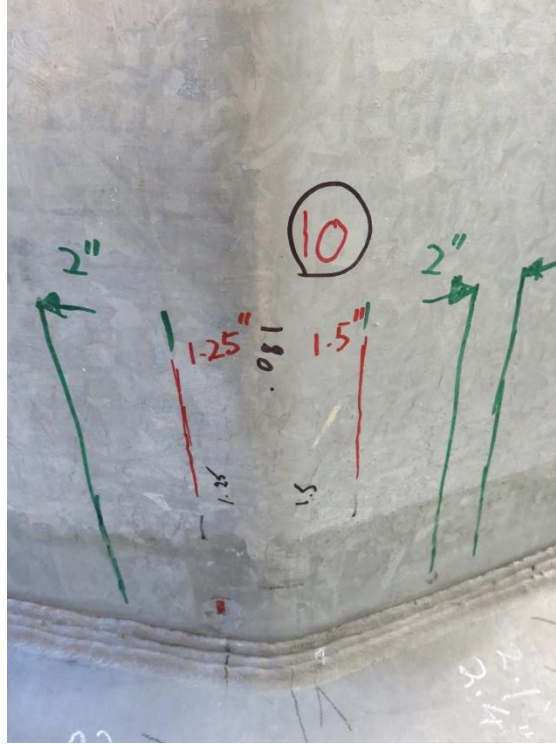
State of Cracks: Specimen 33-3-12-TX-A2 – Bend 10
